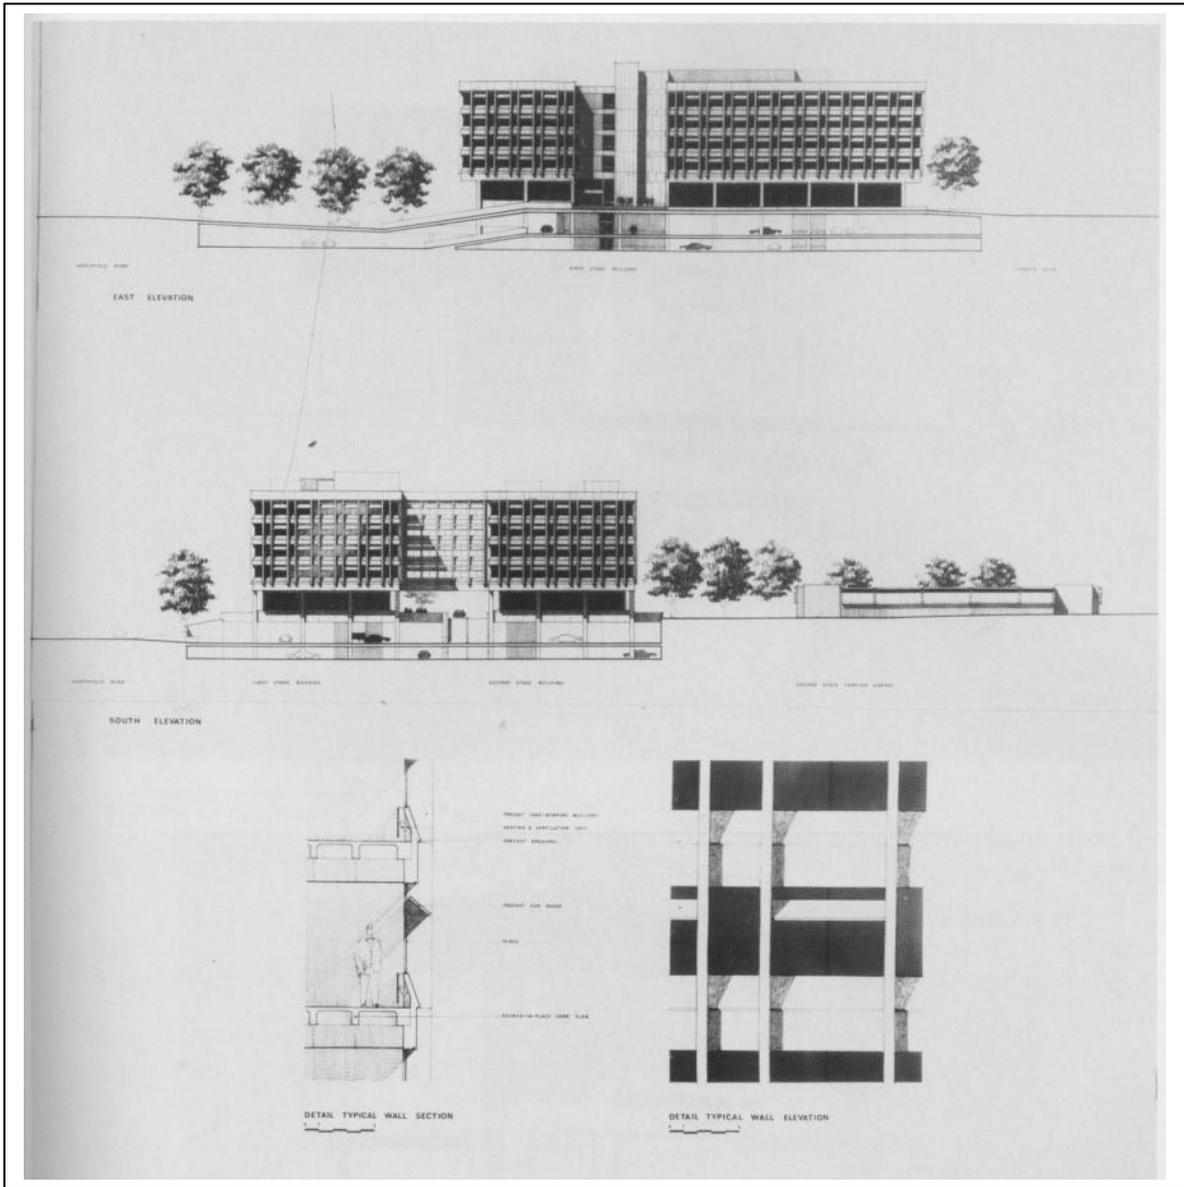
Study Elevations - Low-Rise Scheme, 1964
